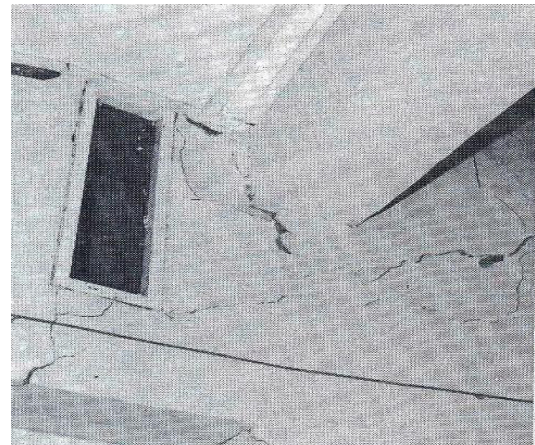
A fragment of a brick wall's destruction ("Druzhba" cotton spinning factory, №8)
